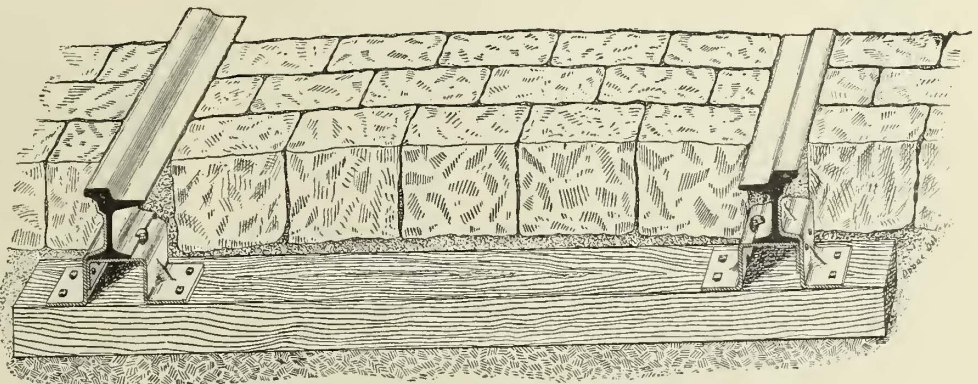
CROSS SECTION STREET CONSTRUCTION, GIRDER RAIL, WRUGHT BRACE CHAIR, MARSHALL CLIPS.
